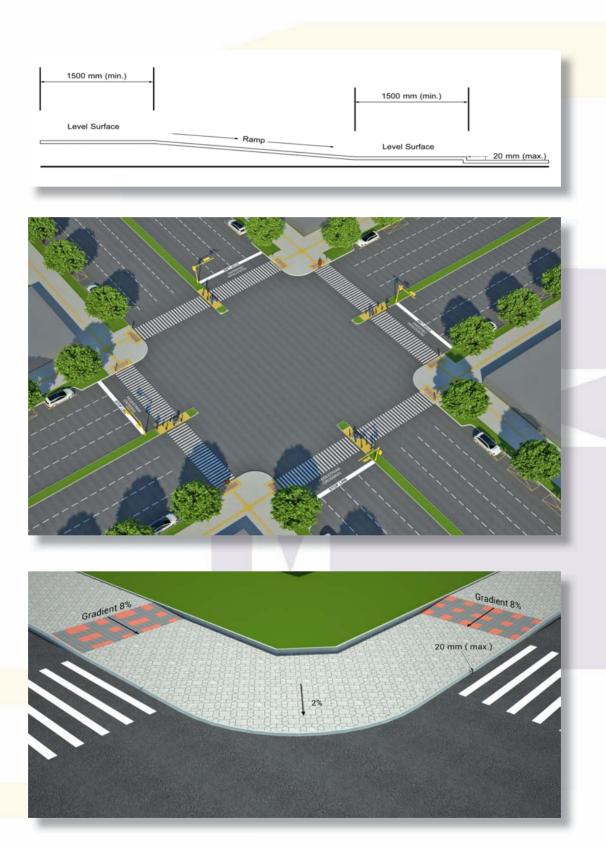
Kerb Ramp Placements at Turnings- Desirable
